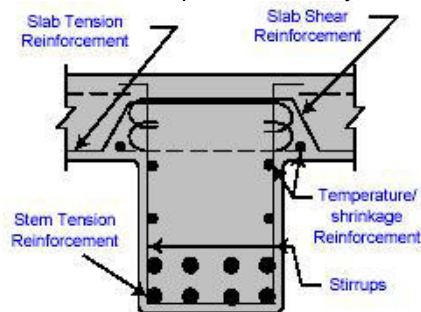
Schematic Steel Reinforcement Arrangement of Concrete T-beams
